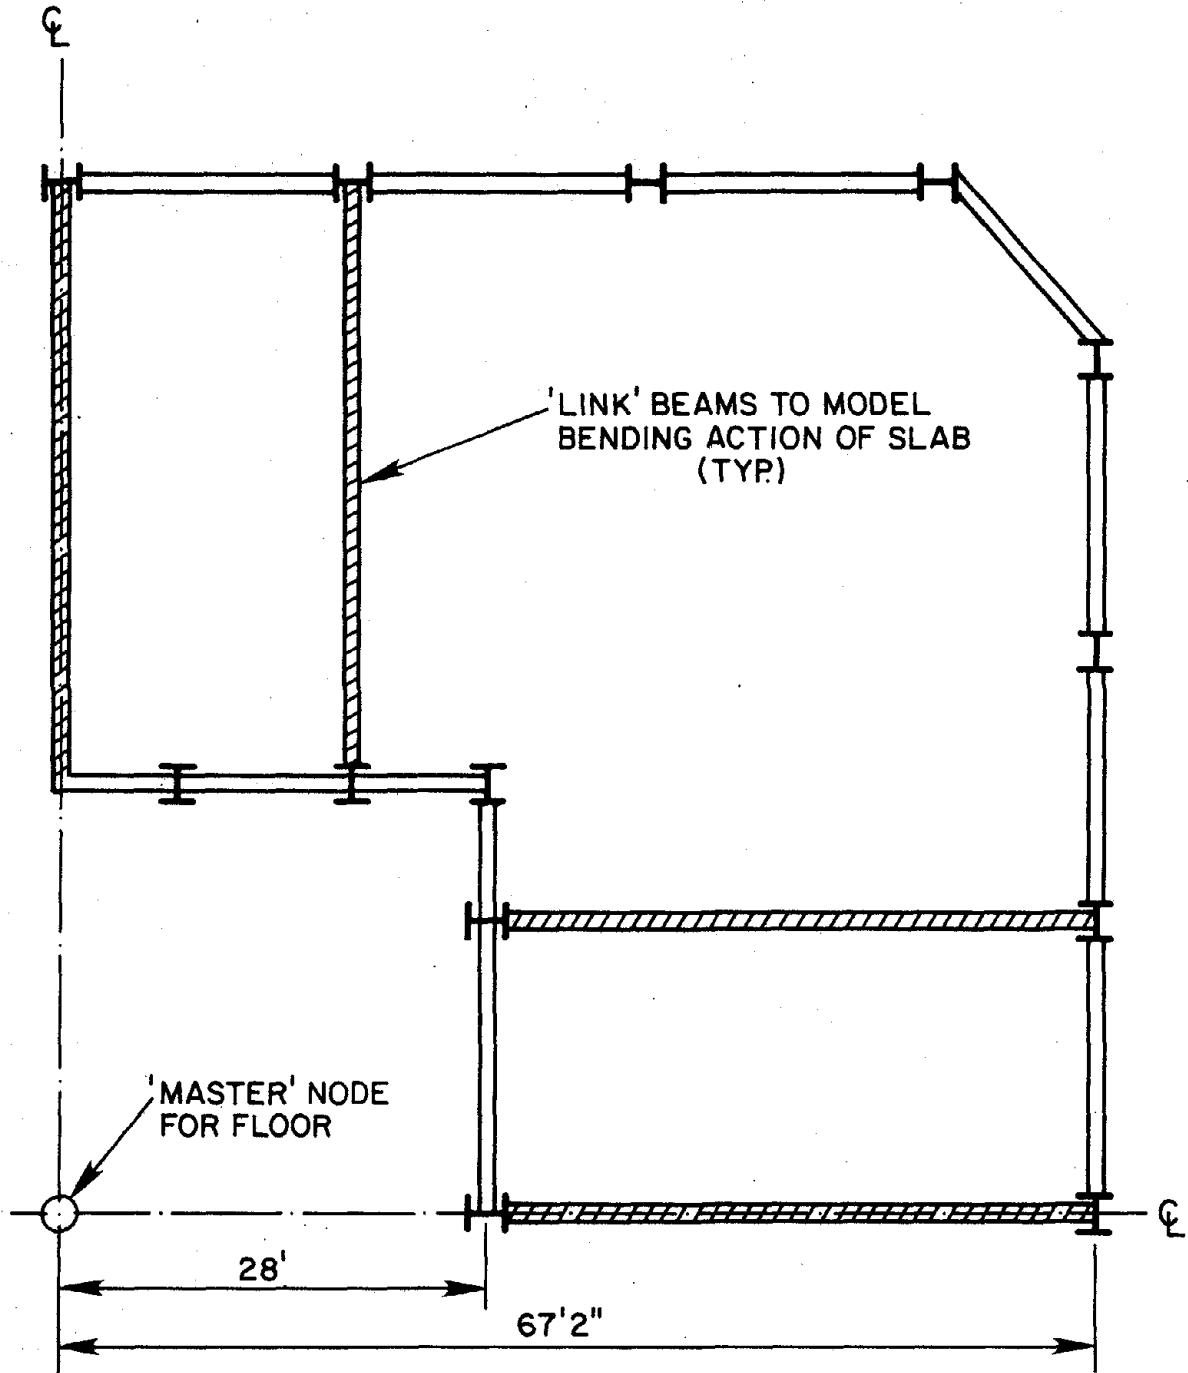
FINITE ELEMENT IDEALIZATION OF TYPICAL UPPER FLOOR
